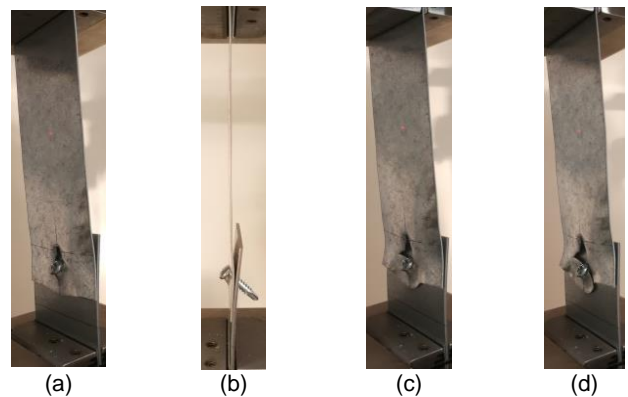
Deformation and failure of a “54-8-30” test with thin sheet buckling towards the fastener head: (a) Peak strength level front view; (b) Peak strength level side view; (c) 80% post peak strength level; (d) After test
